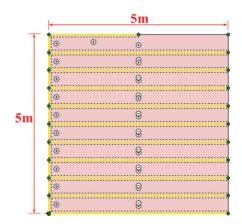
Typical profile of the geosynthetic reinforced soil retaining wall.
